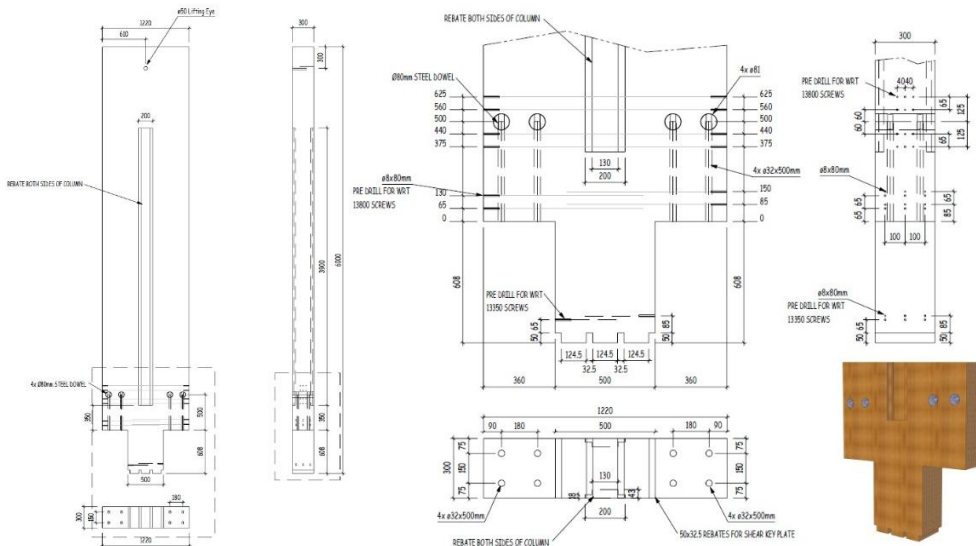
Detailing of the column, the shear key location and the RSFJ connection to the column.
